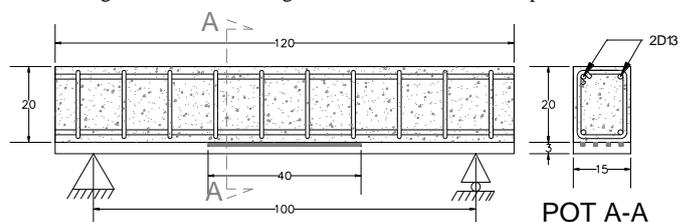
Detail of retrofit reinforced concrete beam specimen with 40 cm bamboo reinforcement
